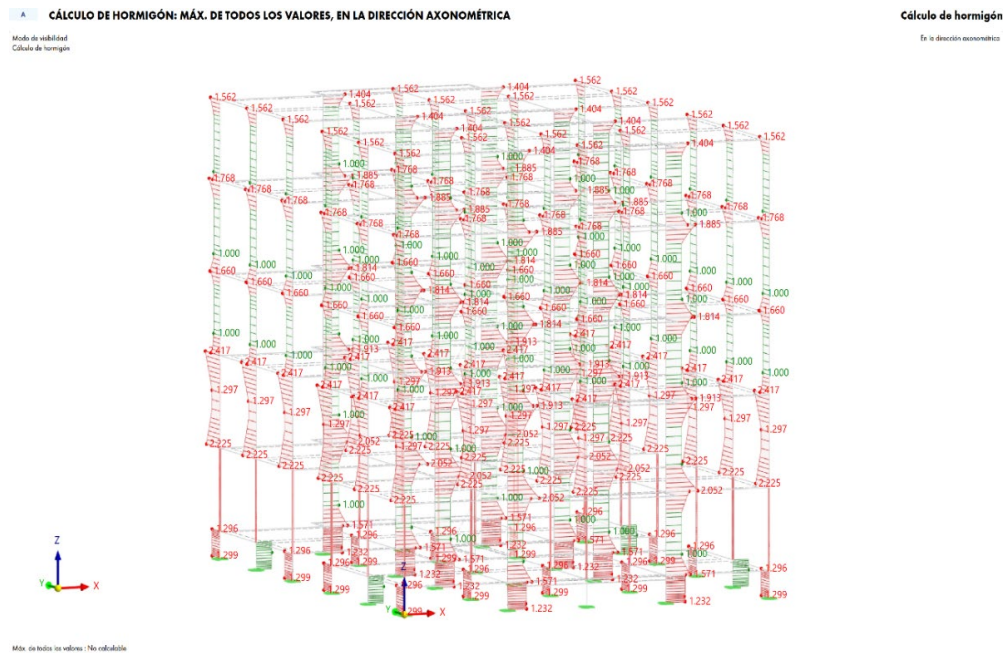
Concrete bars utilization factor. Bars in red show insufficient reinforcement.
